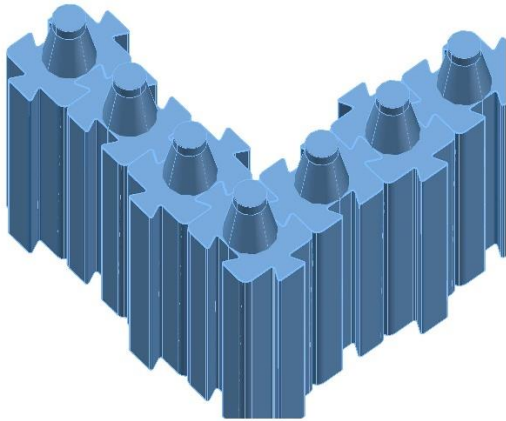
Three-dimensional drawing of the liquid container (PET bottle)
